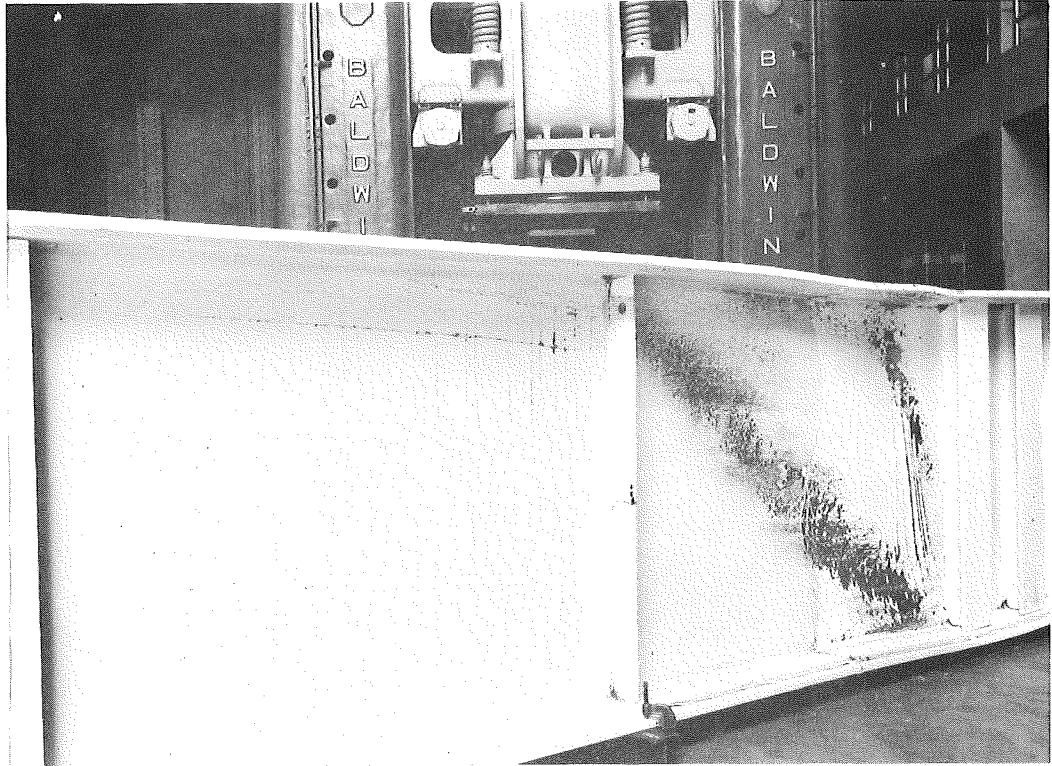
Appearance of Girder E2 After Testing (T2)
